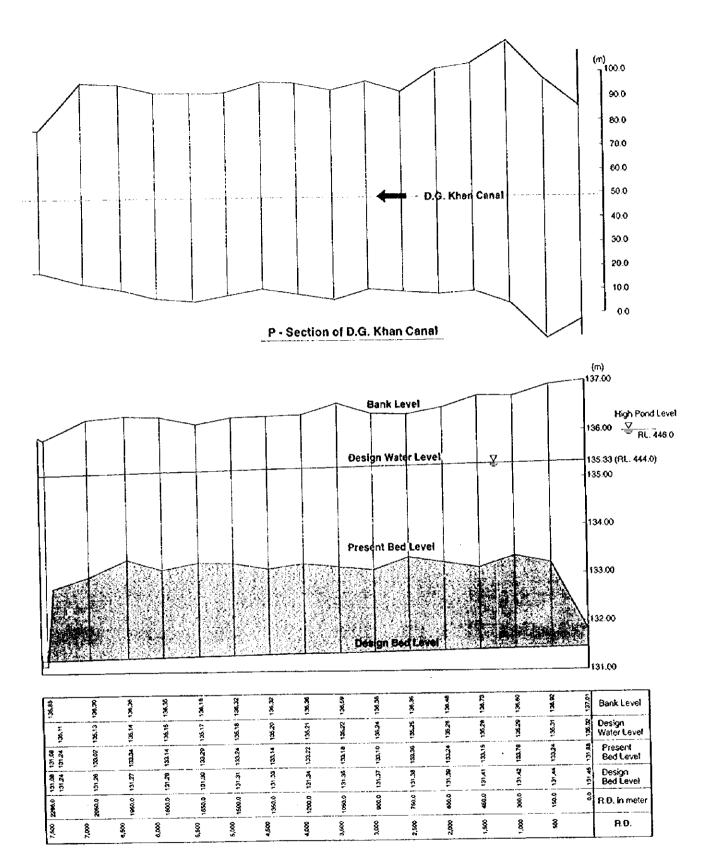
Cross Section of D.G. Khan Canal at Taunsa Barrage (4/4)
